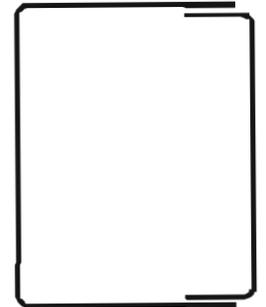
Typical connection detail 3—configuration of transverse reinforcement in the joint region.
